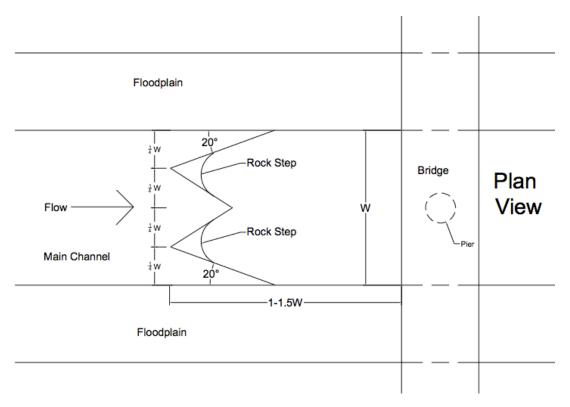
Plan View for Implementing a W-Weir Near Bridges.
